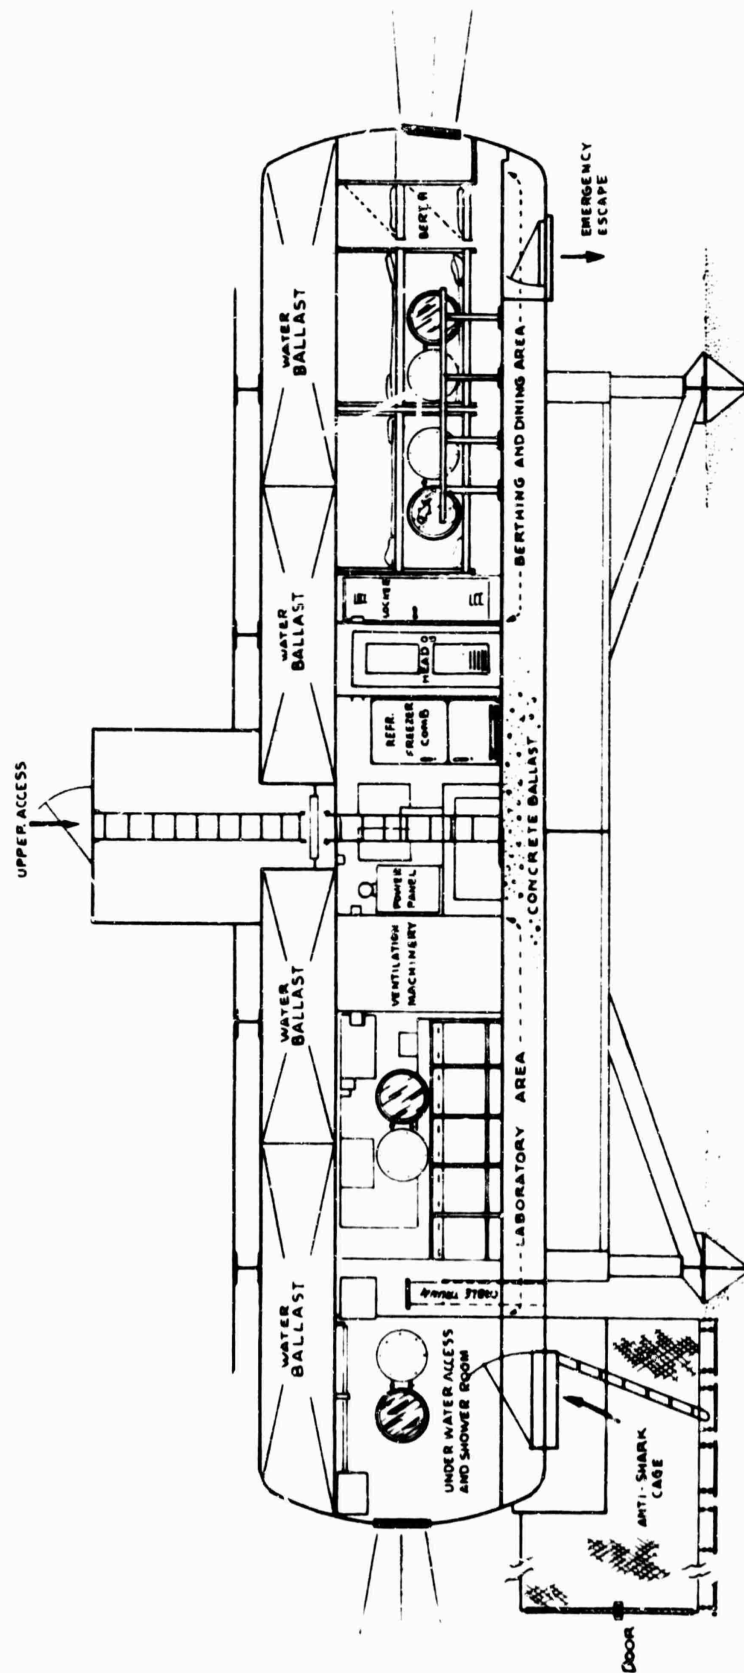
Sealab II interior arrangement, centerline section looking to port
